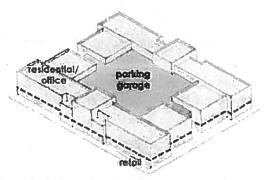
An illustration of a project that incorporates a parking garage within the site design
